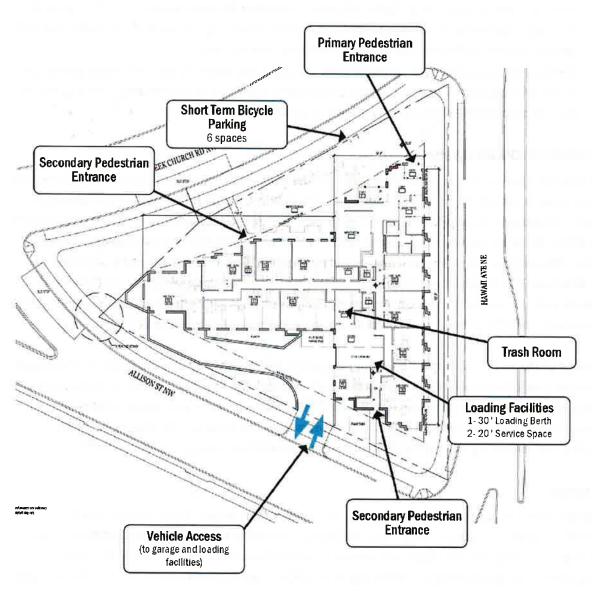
Site Plan (Source: Applicant's Pre-Hearing Statement)
